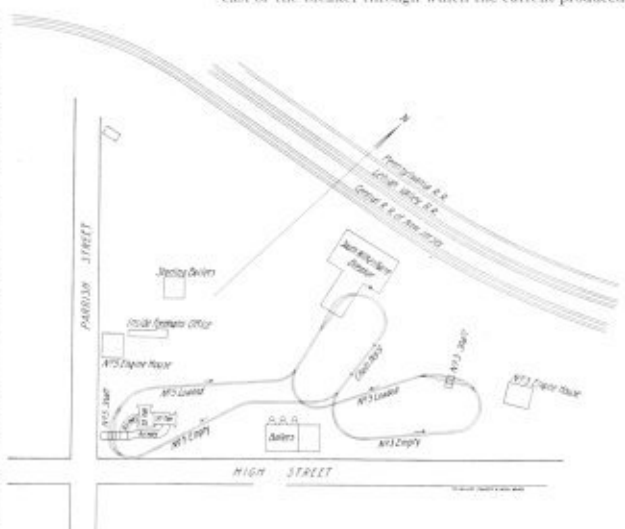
PLAN OF SURFACE ARRANGEMENTS.
